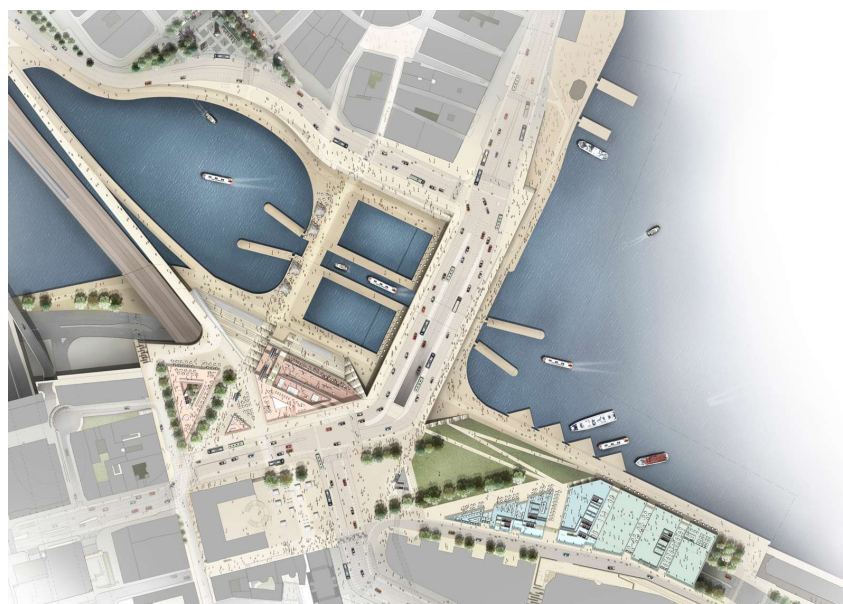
Aerial view of Slussen (Stockholms stad, 2016)
